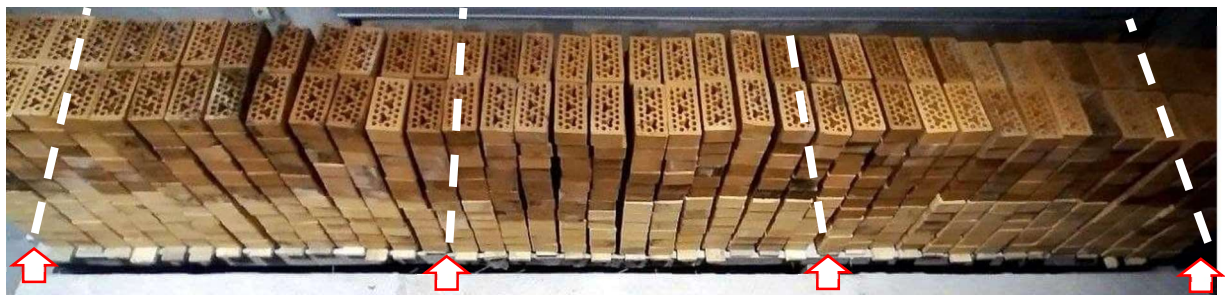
General view of steel reinforced concrete slab during loading with bricks
